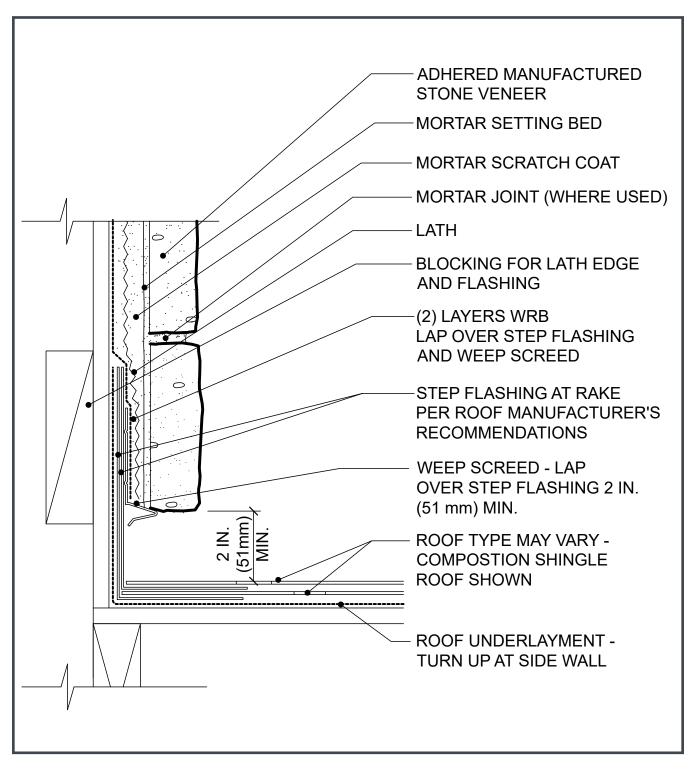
Side Wall - Composition Shingles Over Continuous Insulation
